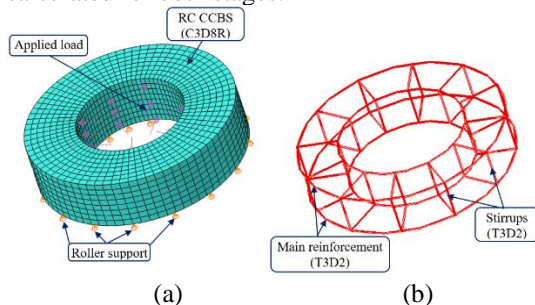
Model set-up: (a) Concrete elements type, loading, and boundary condition, and (b) Types of steel elements.
